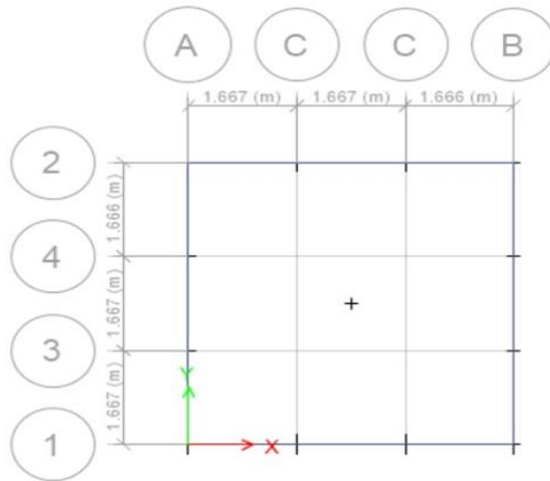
Plan layout for 5m x 5m model with 1 MPa damper
